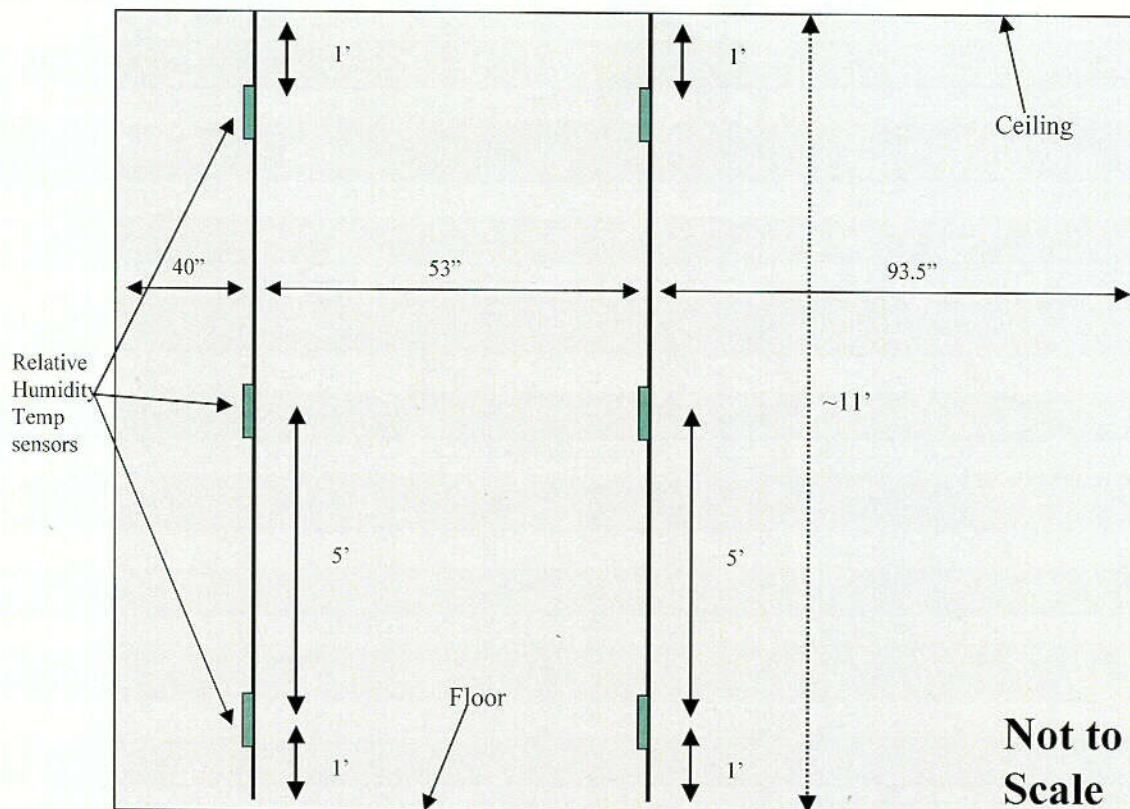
Schematic Sketch of Sensors' Location with Respect to Ceiling and Floor
